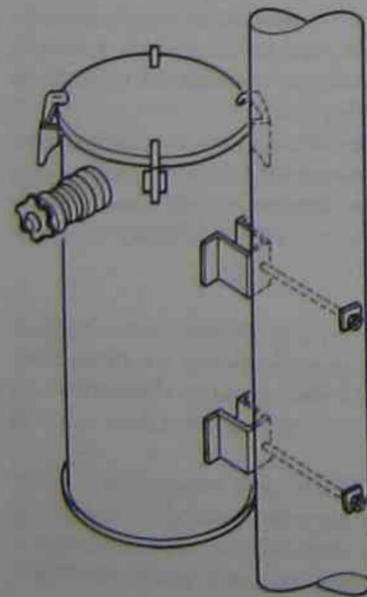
(a) Direct pole mounting of a transformer (Courtesy Westinghouse Electric Co.)
